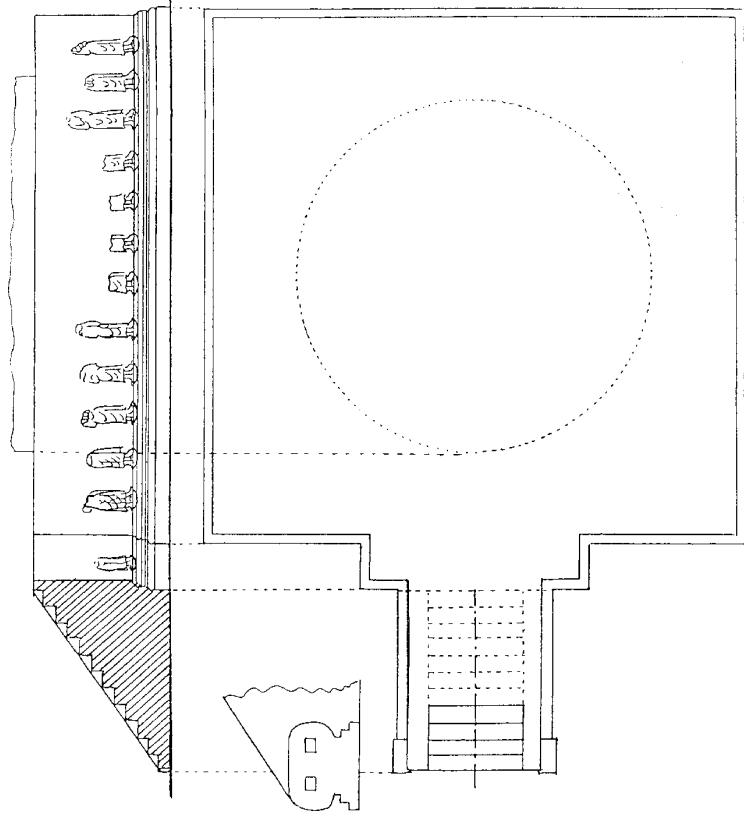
Plan and elevation drawing of Stupa A 1 (south side), Gar-nao, Hadda
